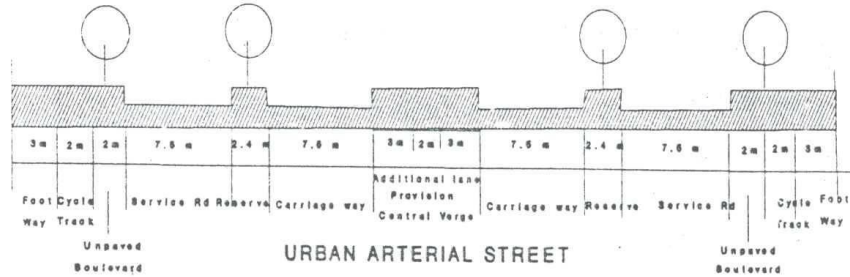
TYPICAL CROSS-SECTIONS OF URBAN ROADS
